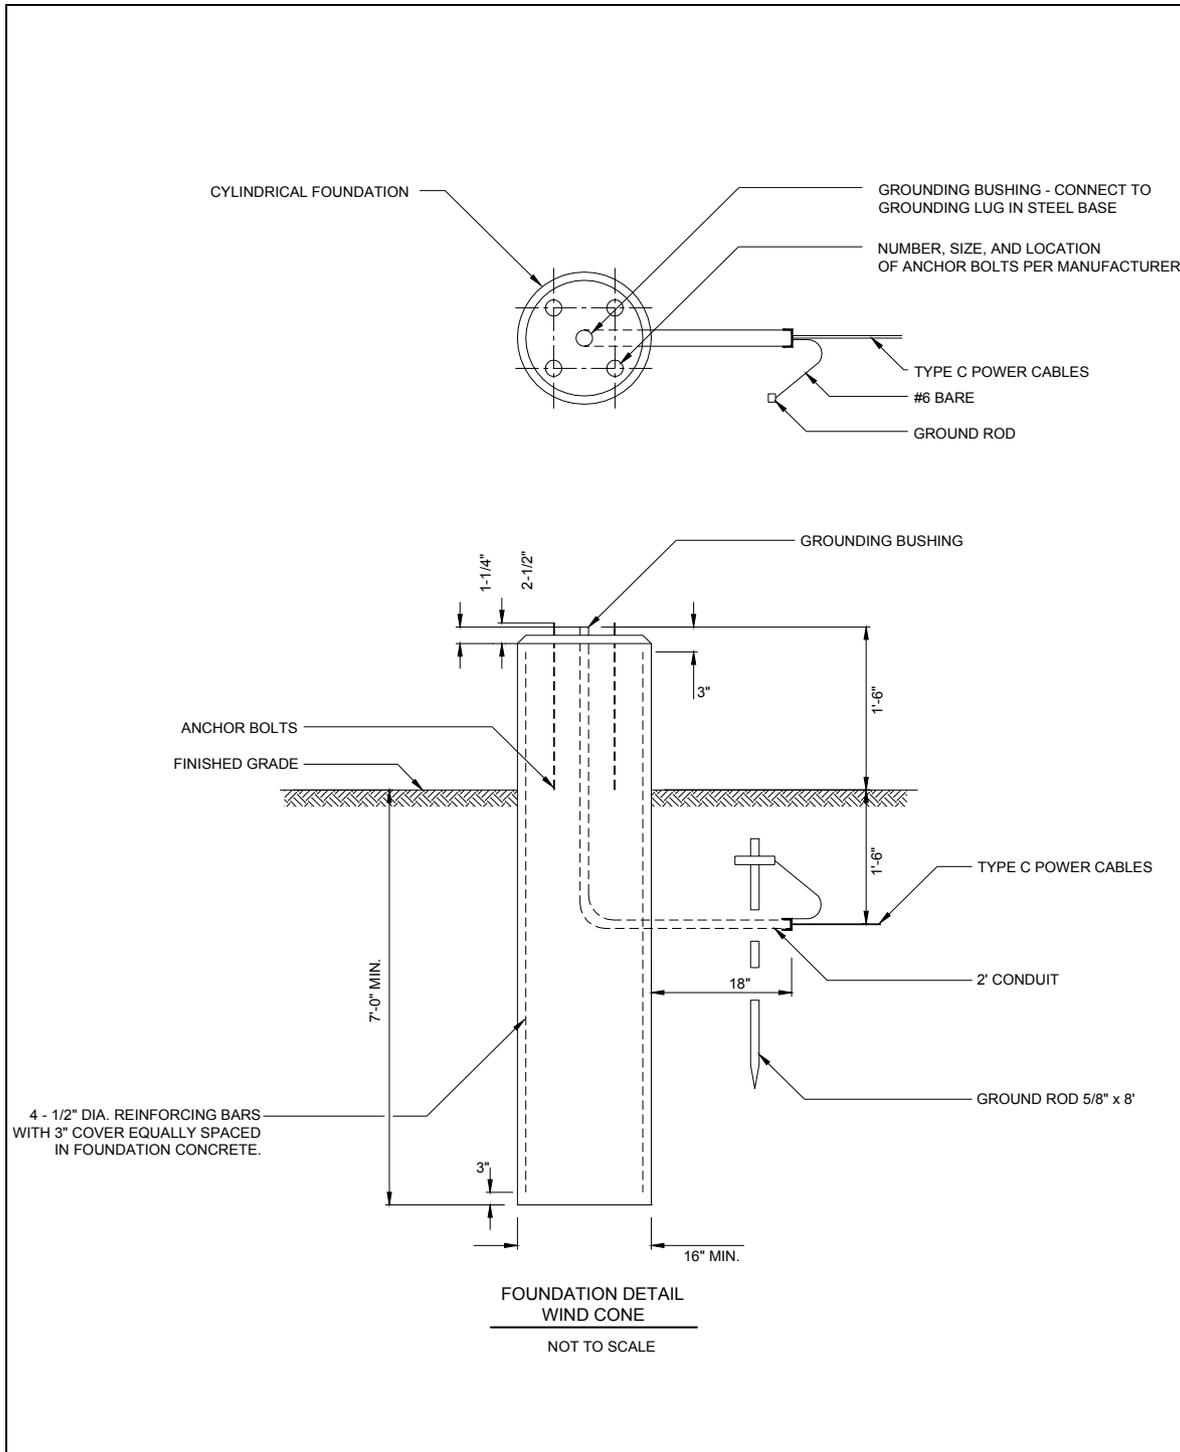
Standard Details for Wind Cone Foundation (L-807)
